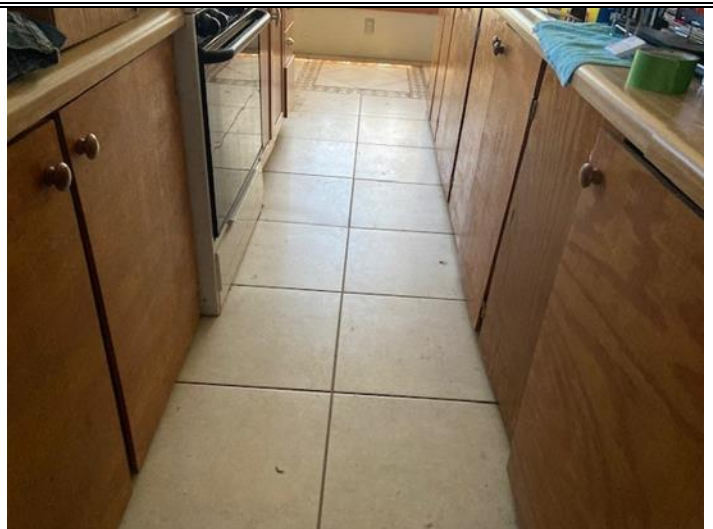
7800 HA W - 16" x 16" Floor Tile
